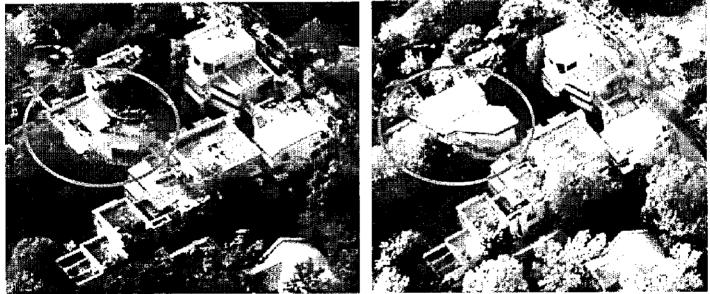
(Before) and Photo10 (After): Detail of Unit 301 Construction
